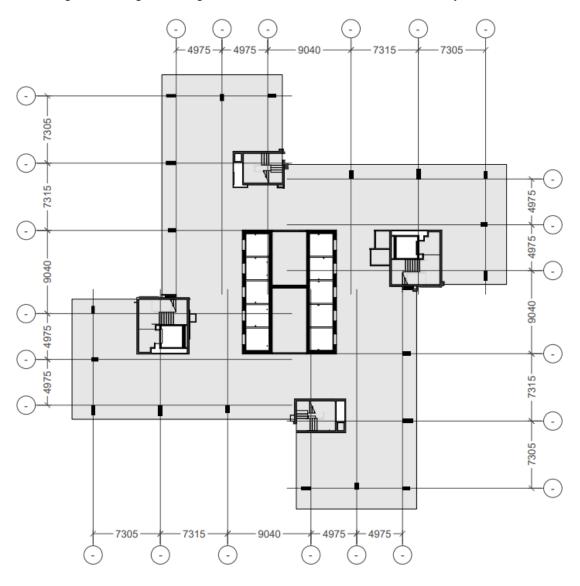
Typical existing office floorplates for tower Level 03 to 19
